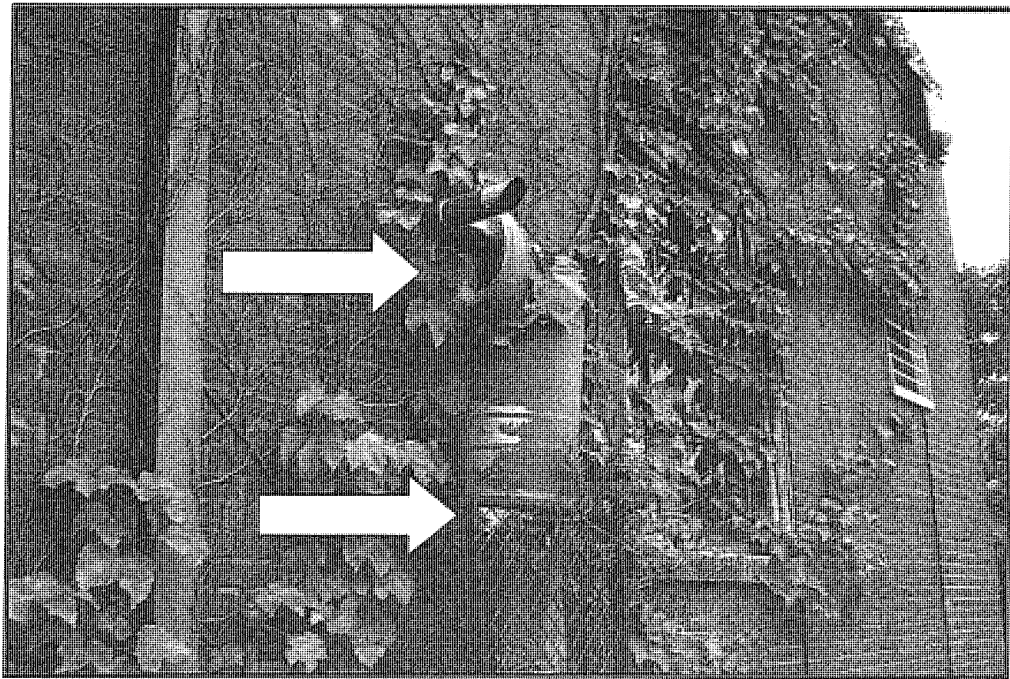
Exposed thermal system insulation on generator vent pipe at Howe Hall.
